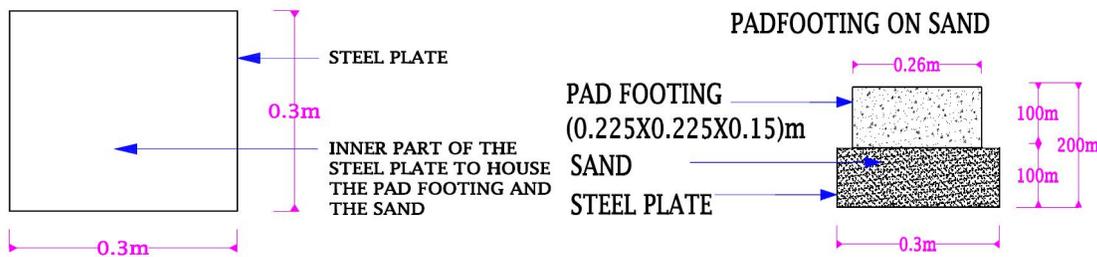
The diagram showing the Pad footing, the steel plate and application of load on the pad footing
